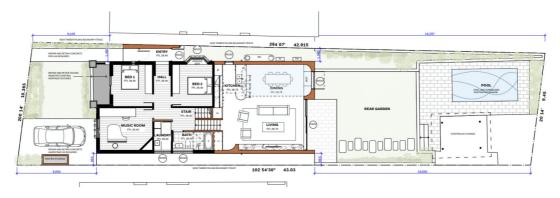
Proposed ground floor plan (Carter Williamson Architects)
